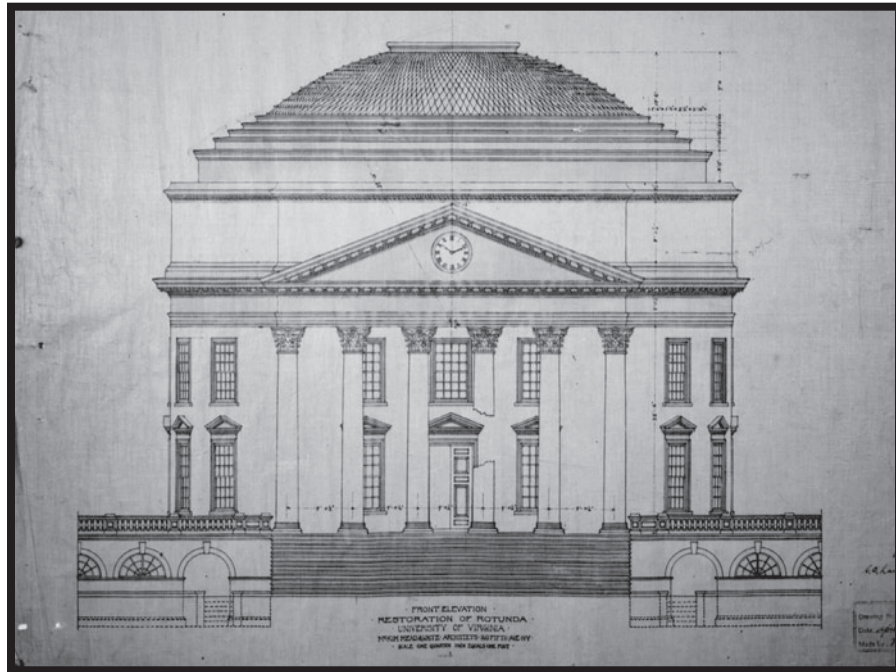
McKim, Mead and White, south elevation, April 9, 1896.
